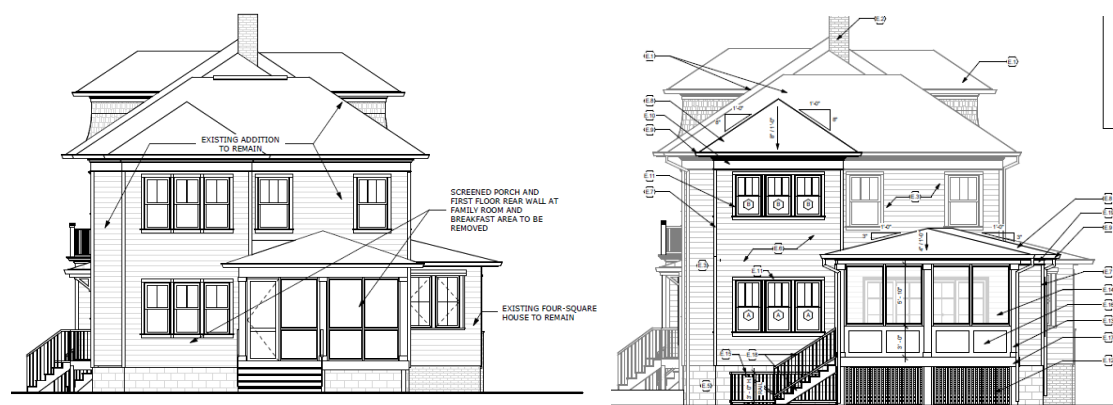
Approved 2021 rear elevation (left) and proposed revision (right).
